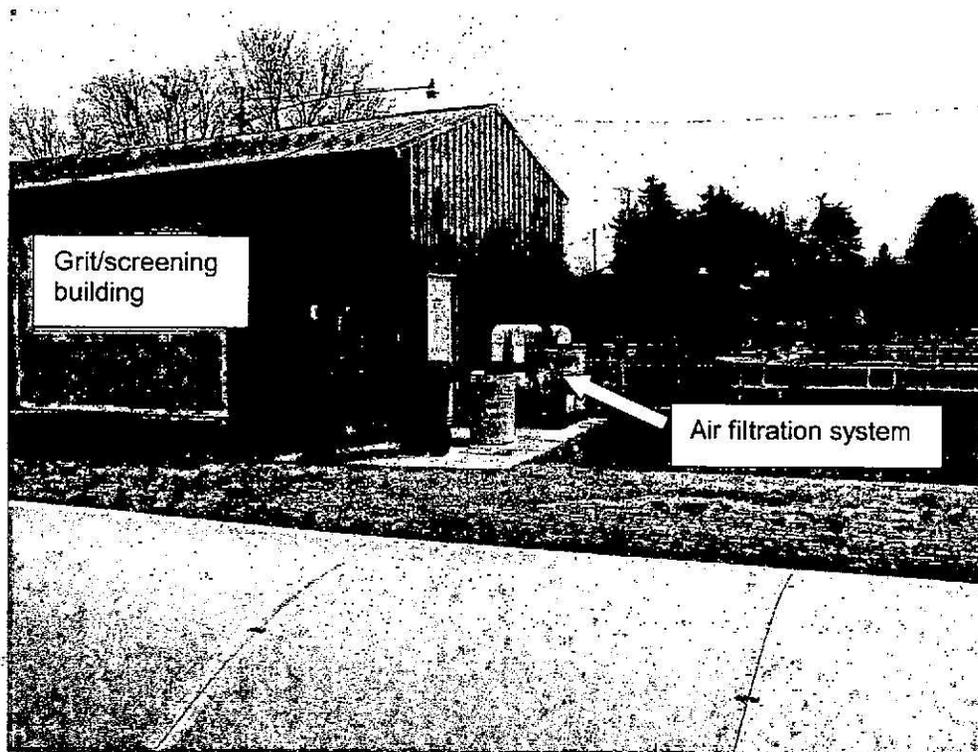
This photograph was taken looking northeast at the Ashville WWTP influent grit/screening building. This building was constructed to enclose and reduce escape of odors from wastewater entering the WWTP. An air filtration system has been attached to the building to help minimize odors from this area.
